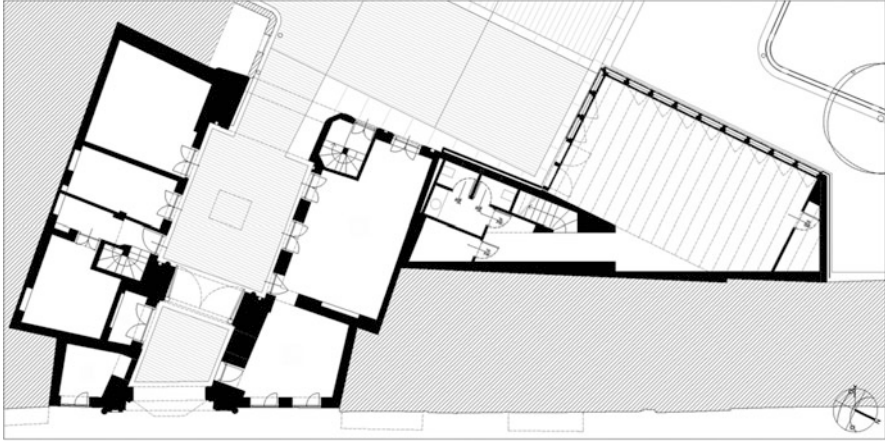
Ground level: the Musa Pak Courtyard Darbar and P.I.R.C building planimetric drawing
